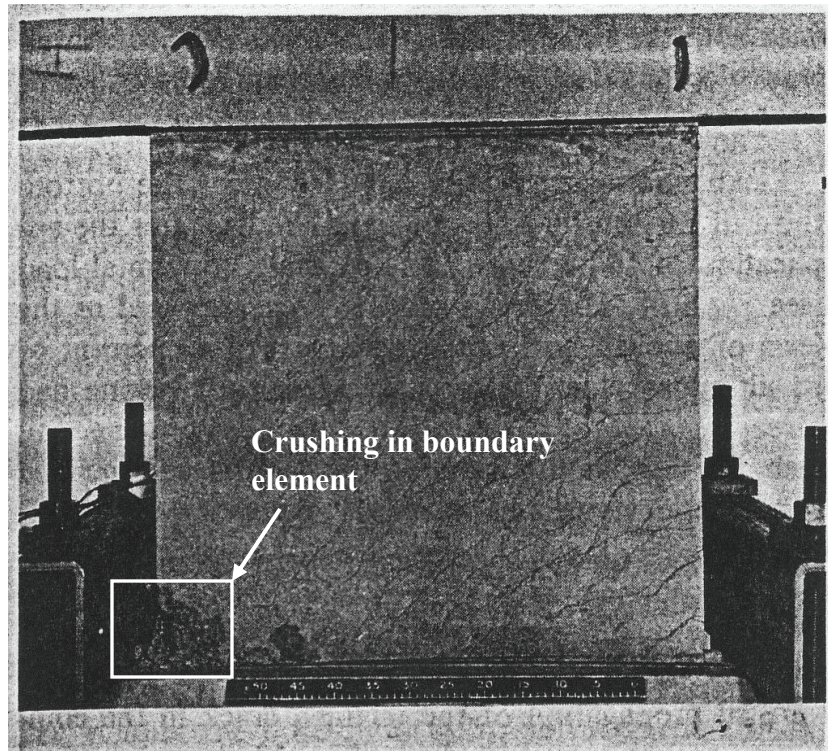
Cracking pattern for wall SW11 tested by Lefas et al. (1990) at compression zone failure
